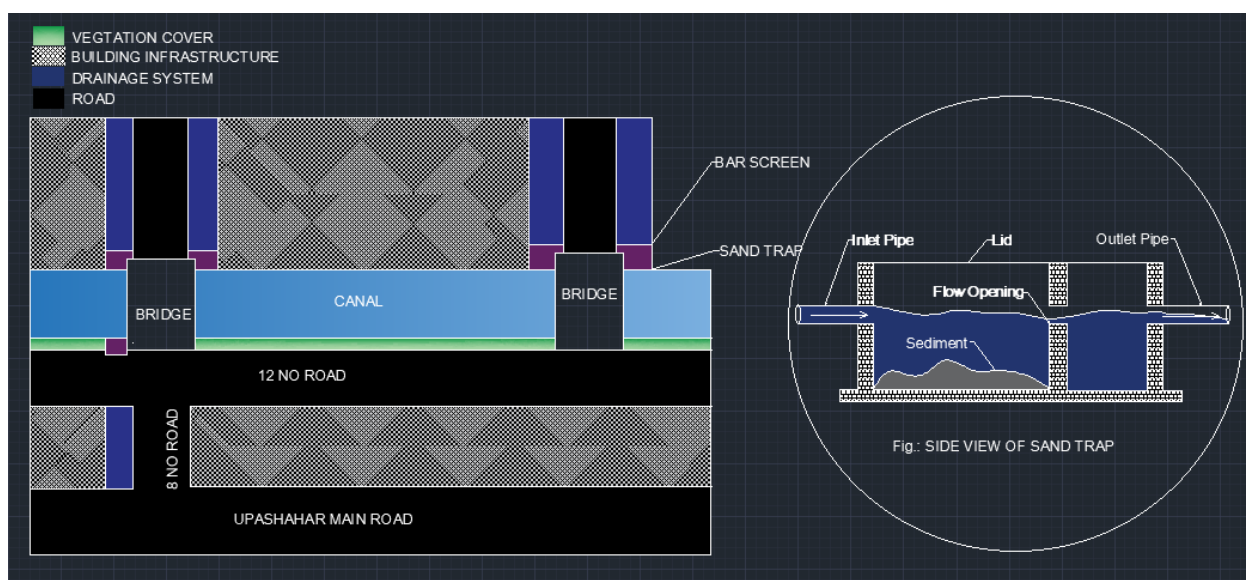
Proposed Layout of Location of Sand Trap and Bar Screen in Drainage System
